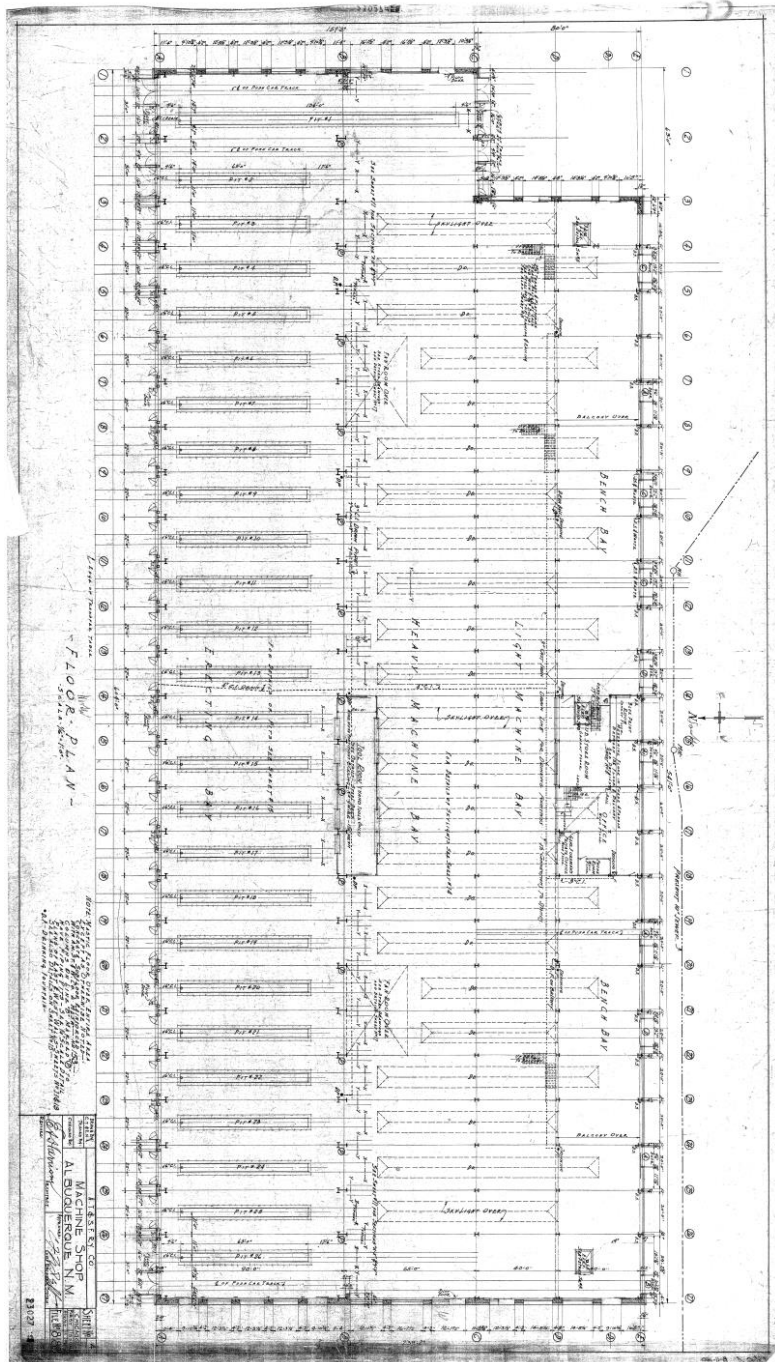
Floor Plan of machine shop. AT&SF Engineers, drawing, c.1920
